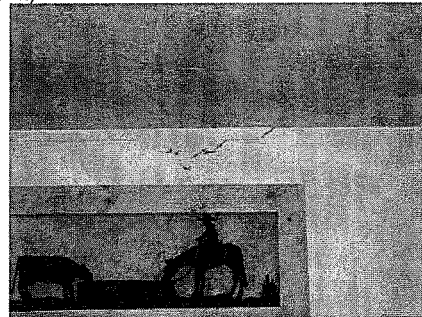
Dry wall cracking (Photo: Chadwell).
